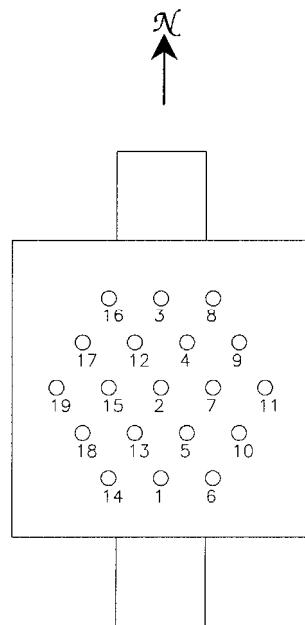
Orientation of western grout containment units at Soil Vault Row 20 disposal location.
